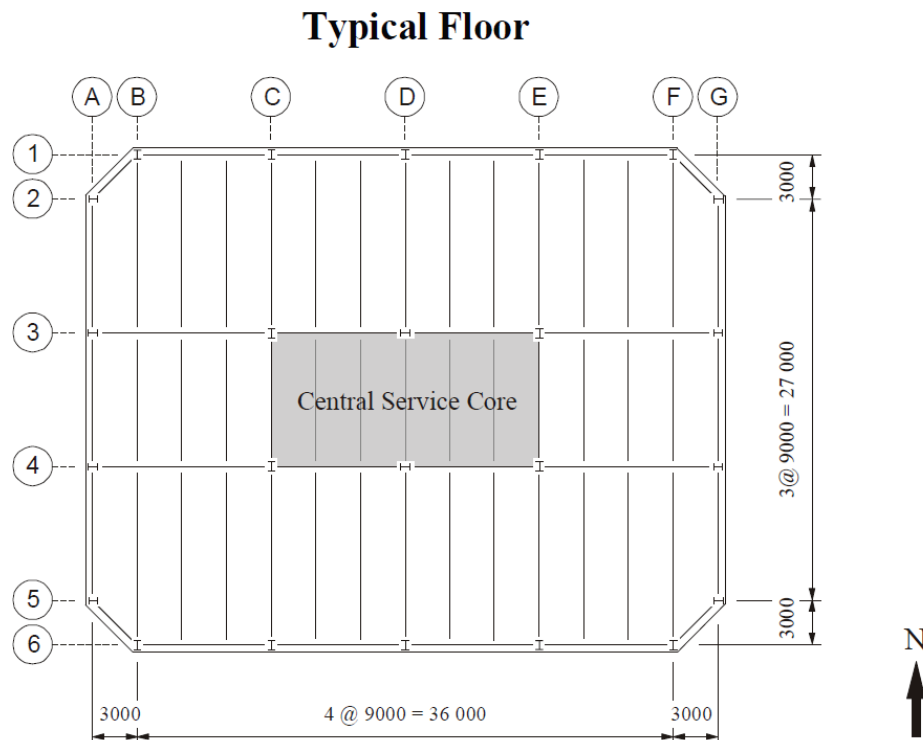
Steel building, typical floor plan (CISC, 2009)
